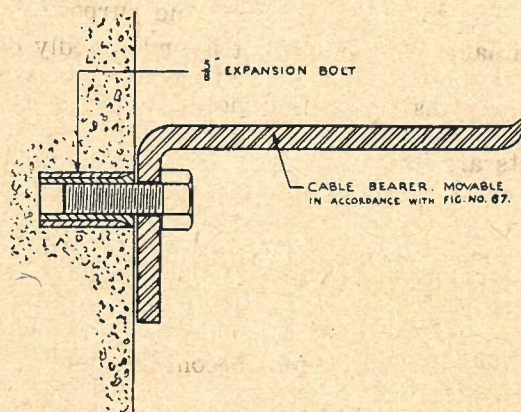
Method of using movable cable bearers without channel iron rack.
